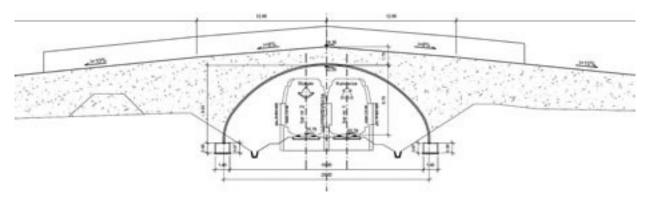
Cross-section (along the structure's axis) of the planned overpasses
